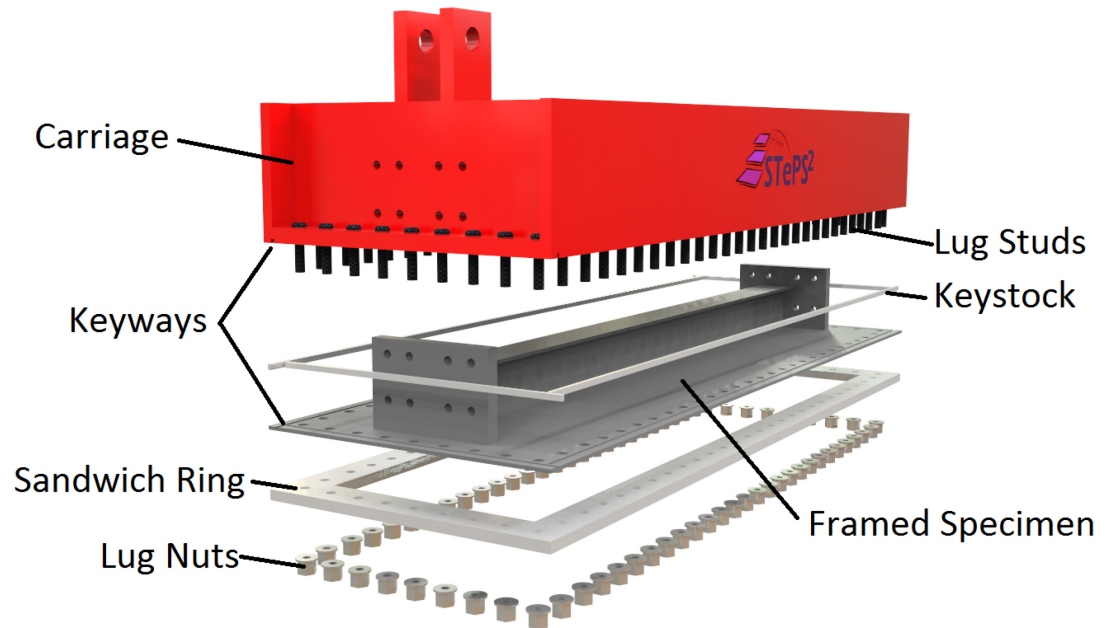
Exploded view of how frame test specimens are installed on the test carriage.
